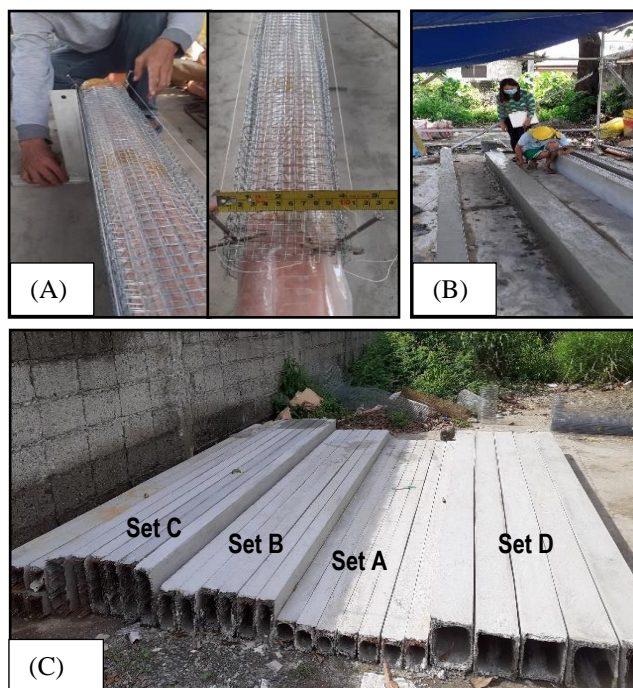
(A) Checking of dimension (B) Casting of samples (C) Curing of samples
